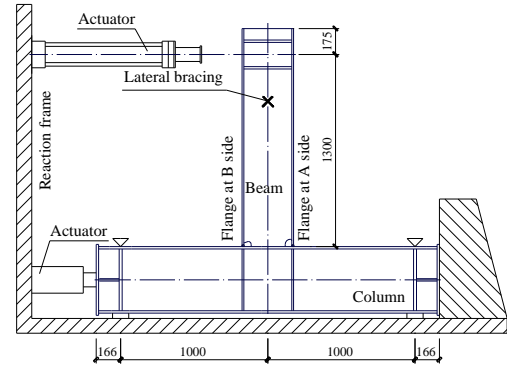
Extremely low cycle fatigue test of beam-column welded joint (Tong *et al.* 2016)
